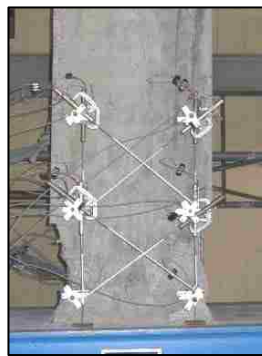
(F5) Concrete Spalling Exposing Longitudinal Steel
